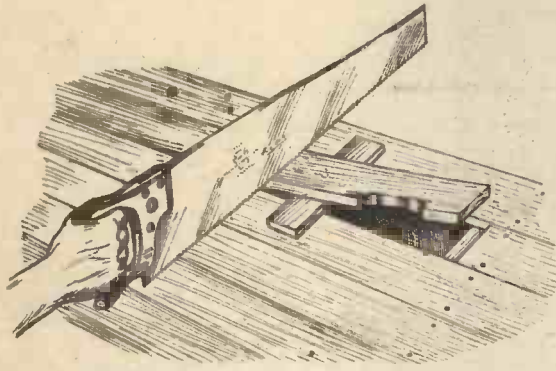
Method of supporting the end of a damaged floorboard whilst sawing through it.
